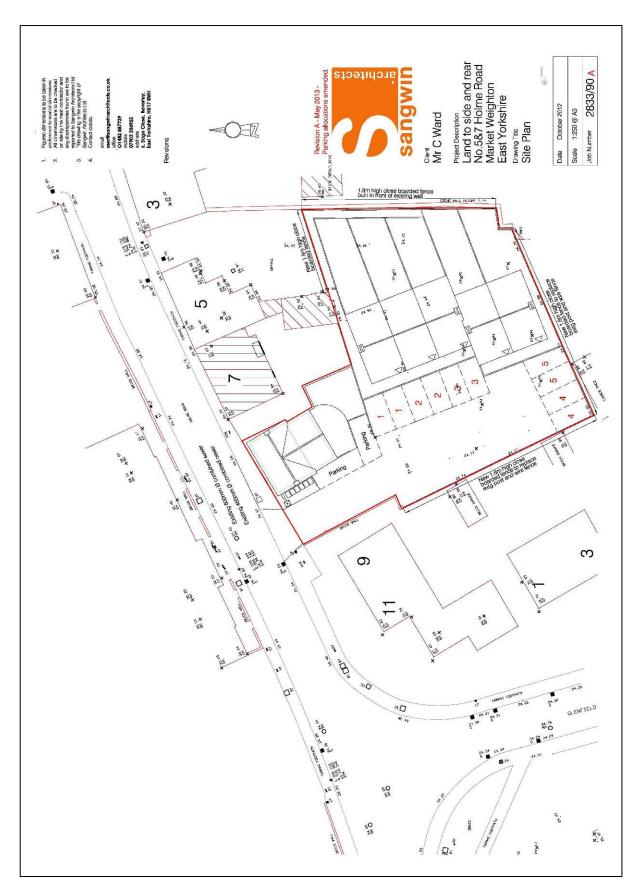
PROPOSED SITE PLAN (not to scale - plan supplied by Sangwin Architects)
